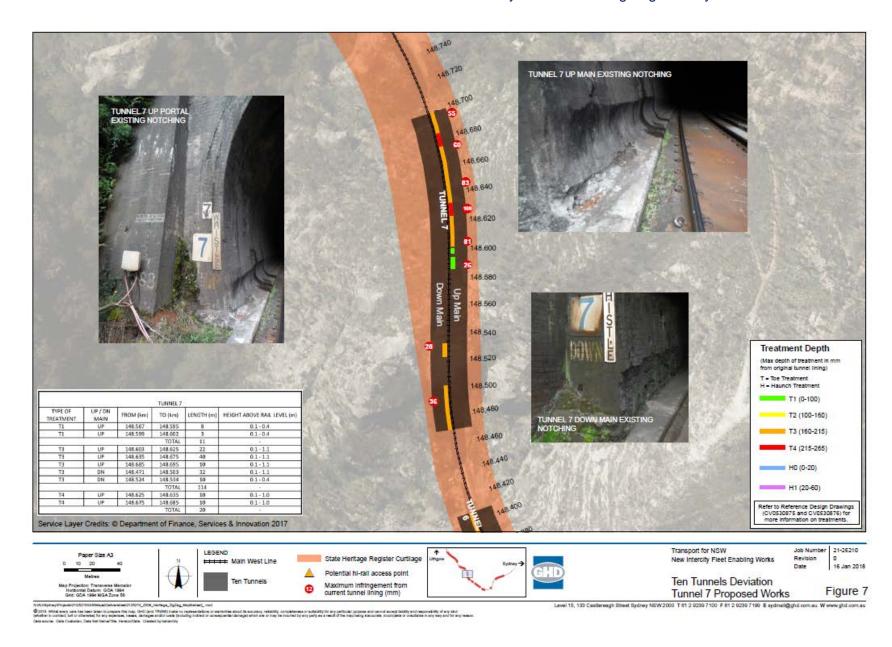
Proposed treatment overview for Tunnel 6 and Tunnel 7 (GHD Great Zig Zag Railway deviation tunnels Heritage Design Summary 2018)
